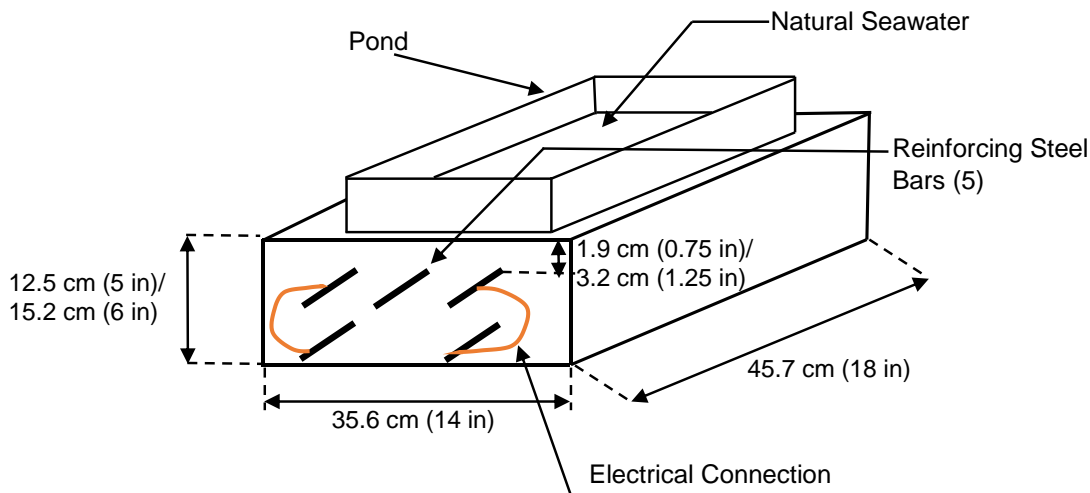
Five-rebar specimen diagram (outdoor specimens)
